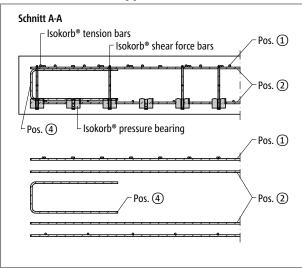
Schöck Isokorb® XT type K: On-site reinforcement with indirect support
